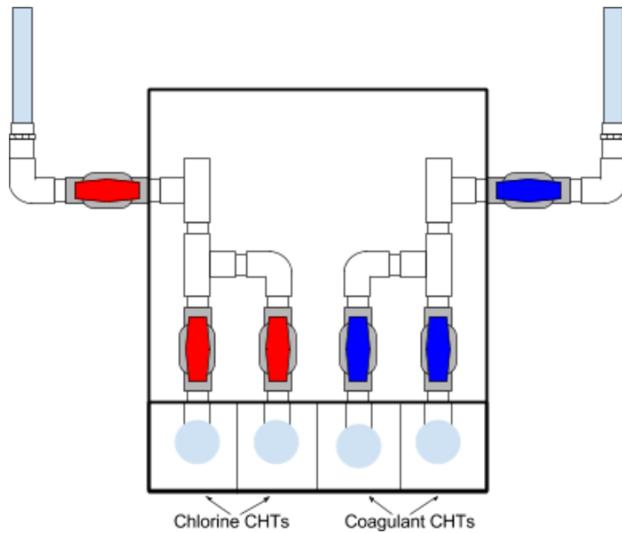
Front view of MCHT 1.0. The design is able to be mounted against a wall. Note: This figure does not show the outlet and drain tubing.
